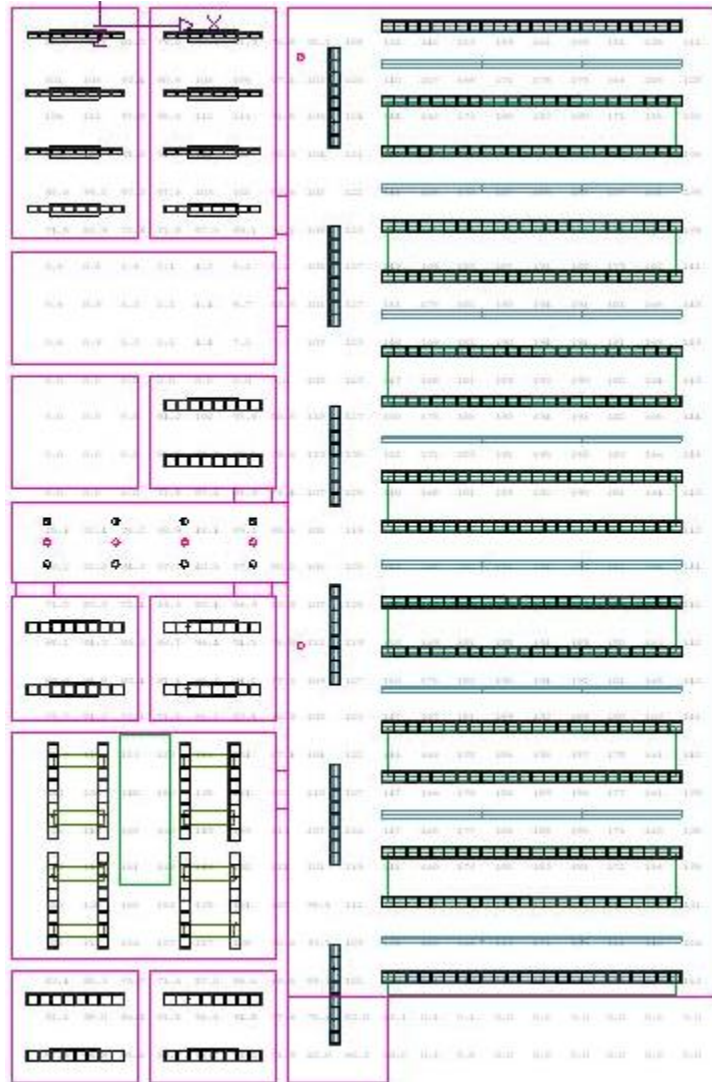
Lighting Layout for Laboratory 285, New Design
